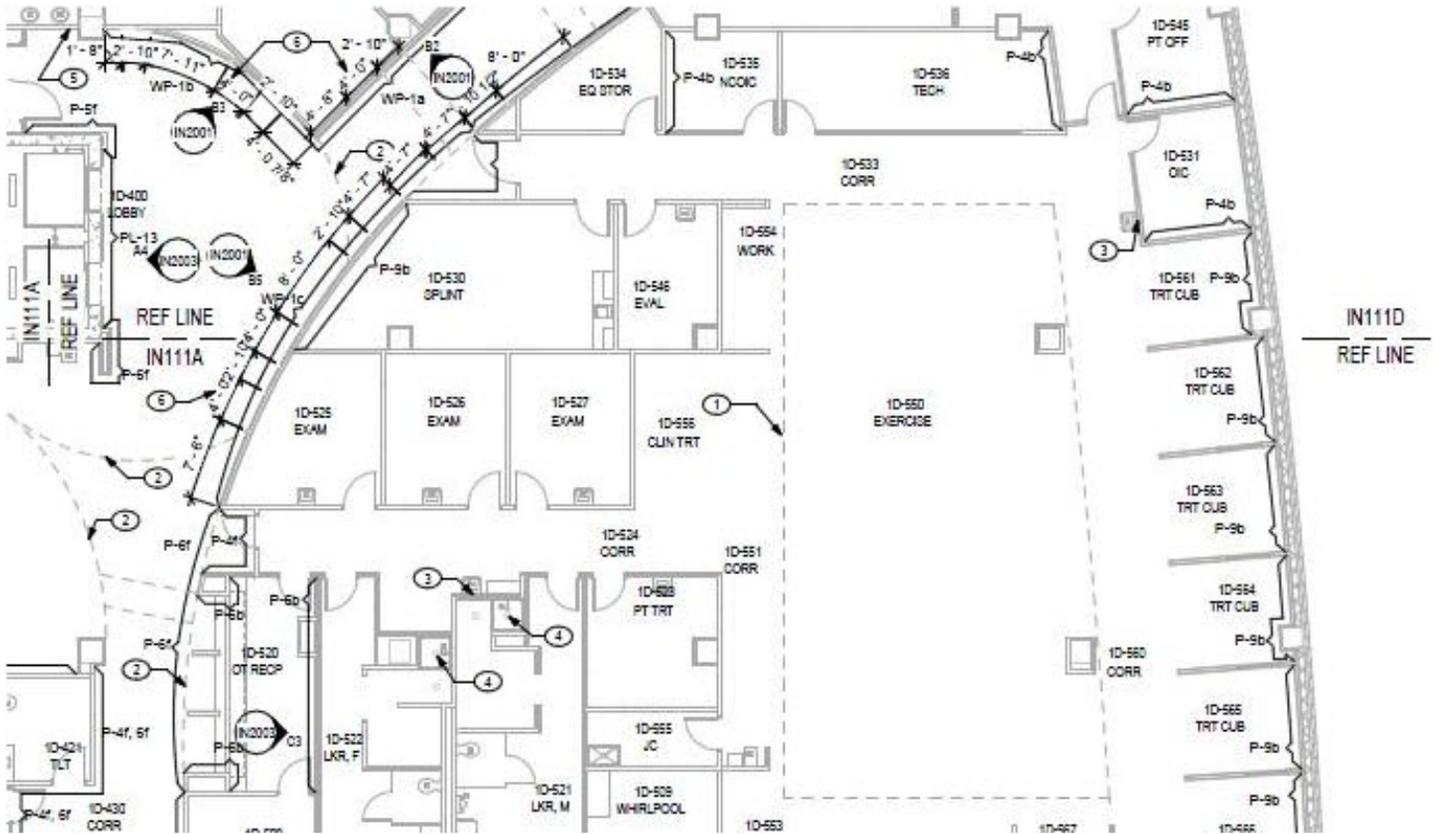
Wall finishes are represented with stretchable brackets. The material note is a wall tag.
